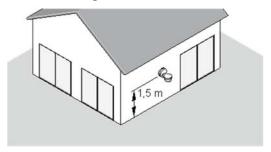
Wall mounting on a detached single-family house 6851/22S-xxx
